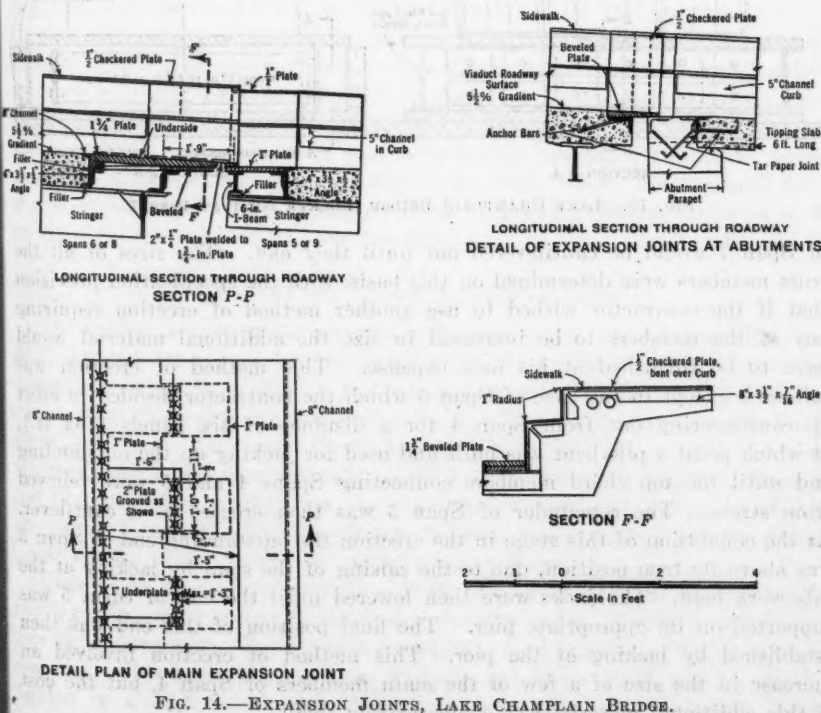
EXPANSION JOINTS, LAKE CHAMPLAIN BRIDGE.
